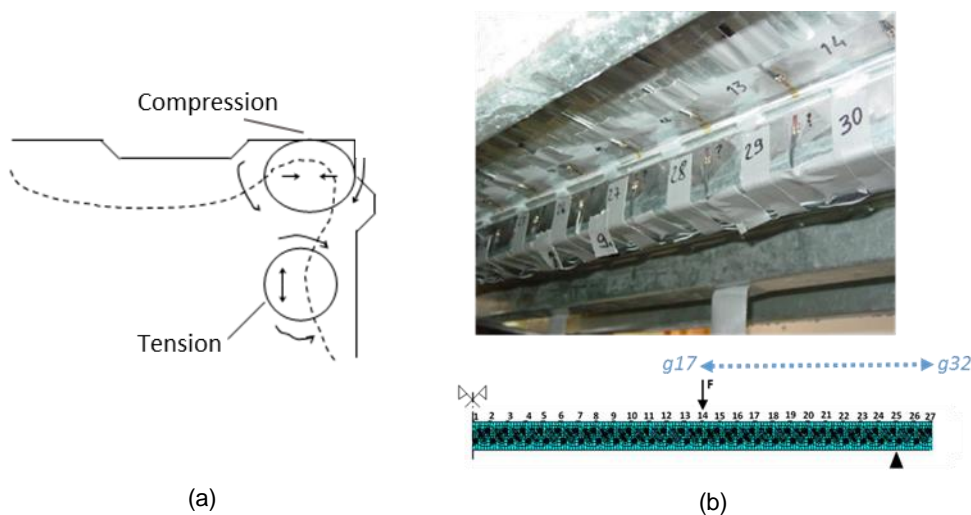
Vertical disconnection between the steel deck and the concrete slab
